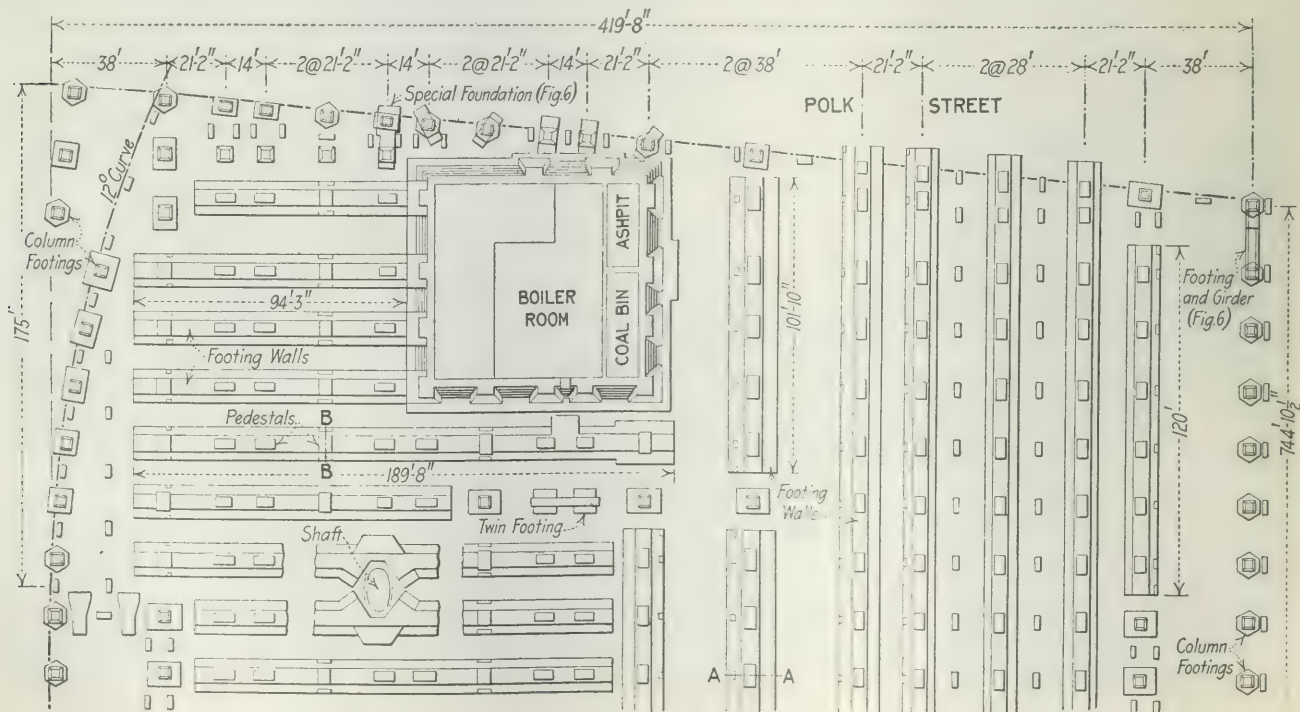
FOUNDATION PLAN OF PENNSYLVANIA LINES' CHICAGO FREIGHT TERMINAL
